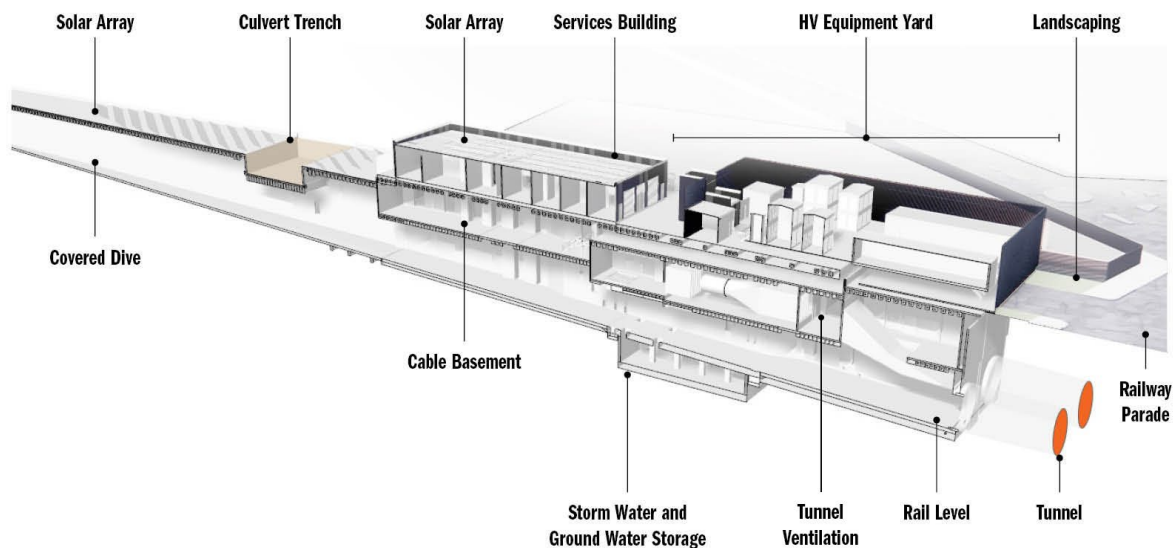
Marrickville Dive – Underground dive structure sectional perspective
